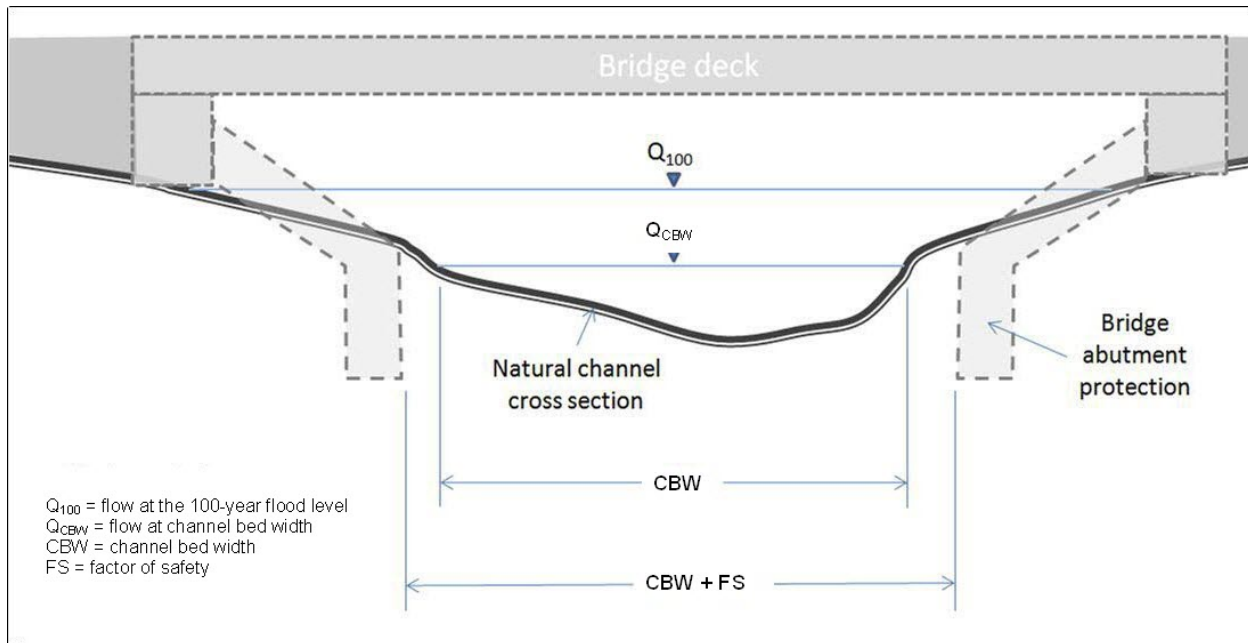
Bridge cross section over a confined channel showing the relationship between the channel bed width and the recommended width between abutment protections. The factor of safety is determined by the designer. The bridge may also be founded on piling or drilled shafts which would eliminate scour risk.
